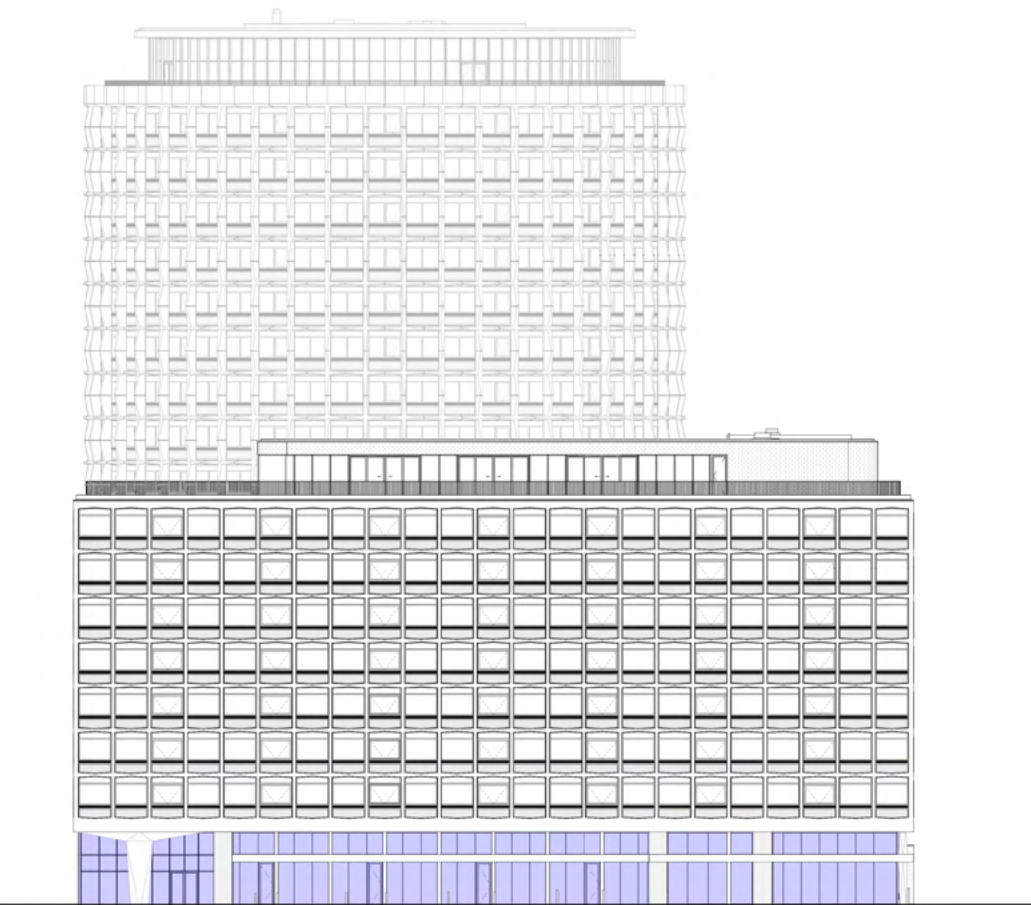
Kingsway West Elevation - MAT 01 location
